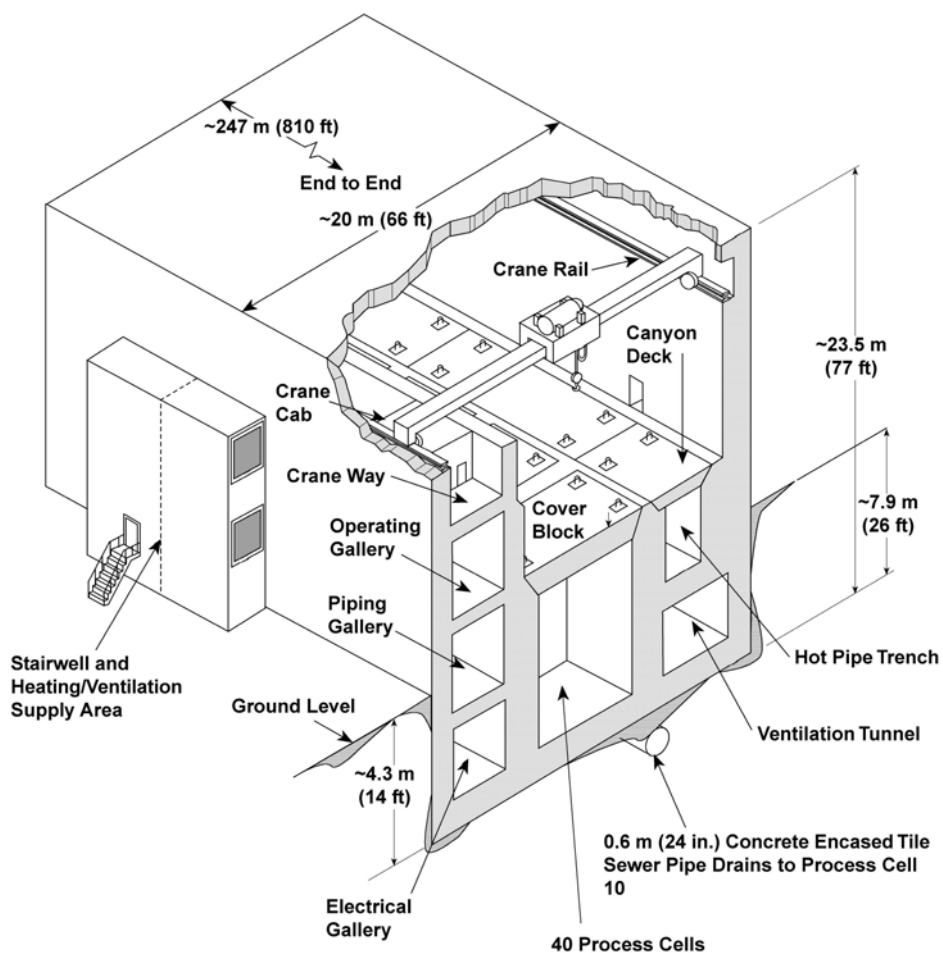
Cross Section of 221-U Building (Jacques 2001)
